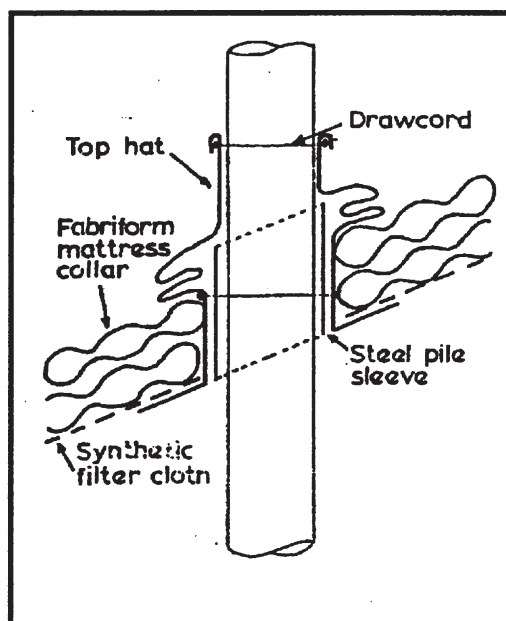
Flexible collar arrangement at a pile to seal the joint with a mattress.
